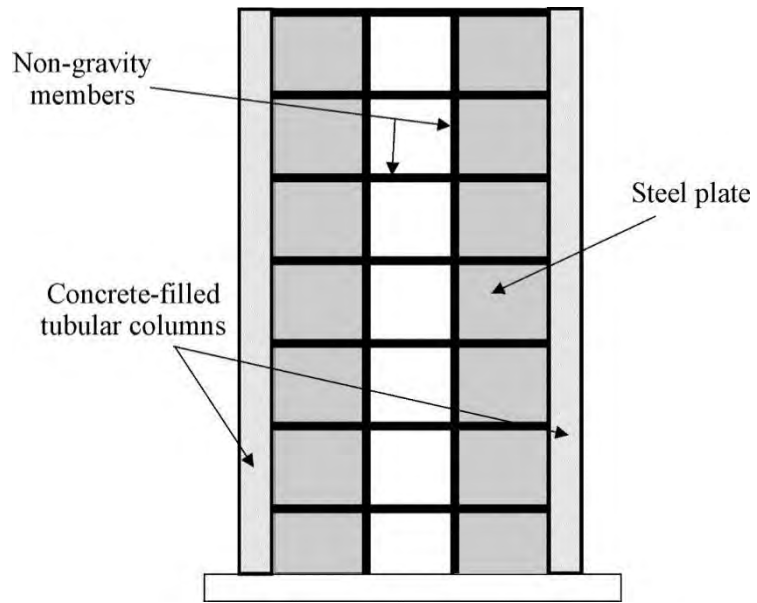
8: Steel plate shear wall system studied by Astaneh-Asl and Zhao (2002)
